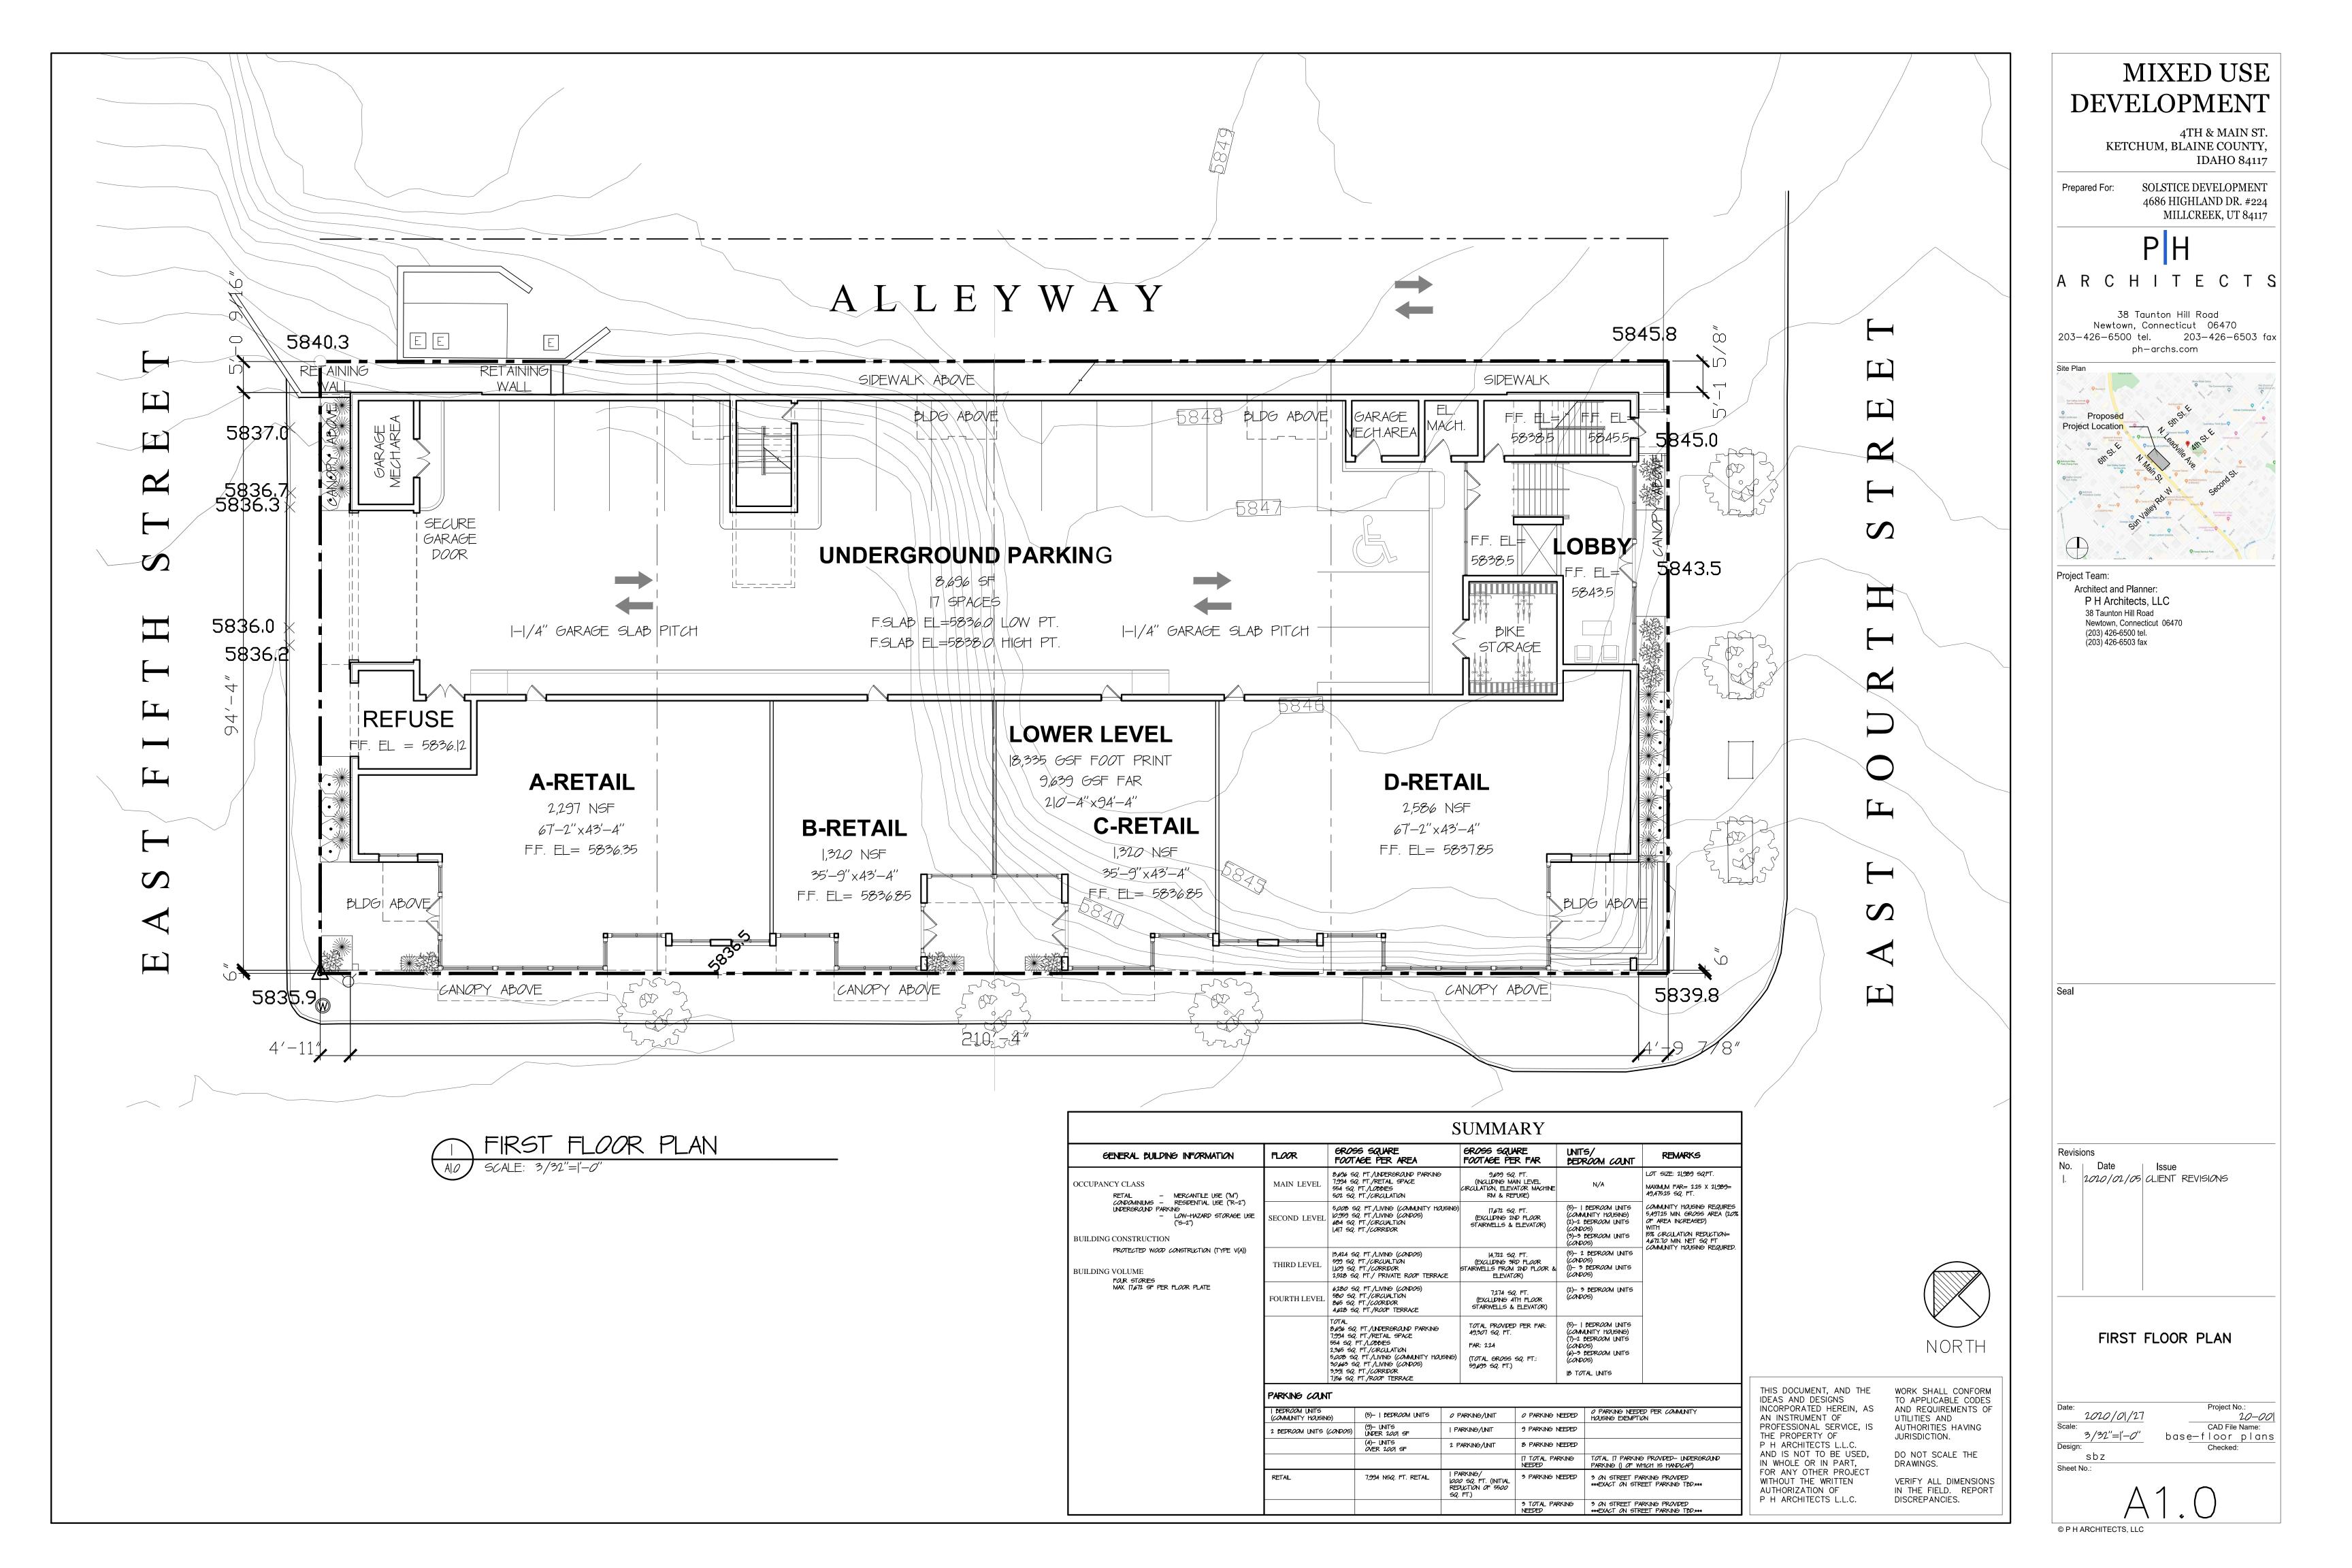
h and Main Mixed-Use Building Pre-Application Design Review Submittal
